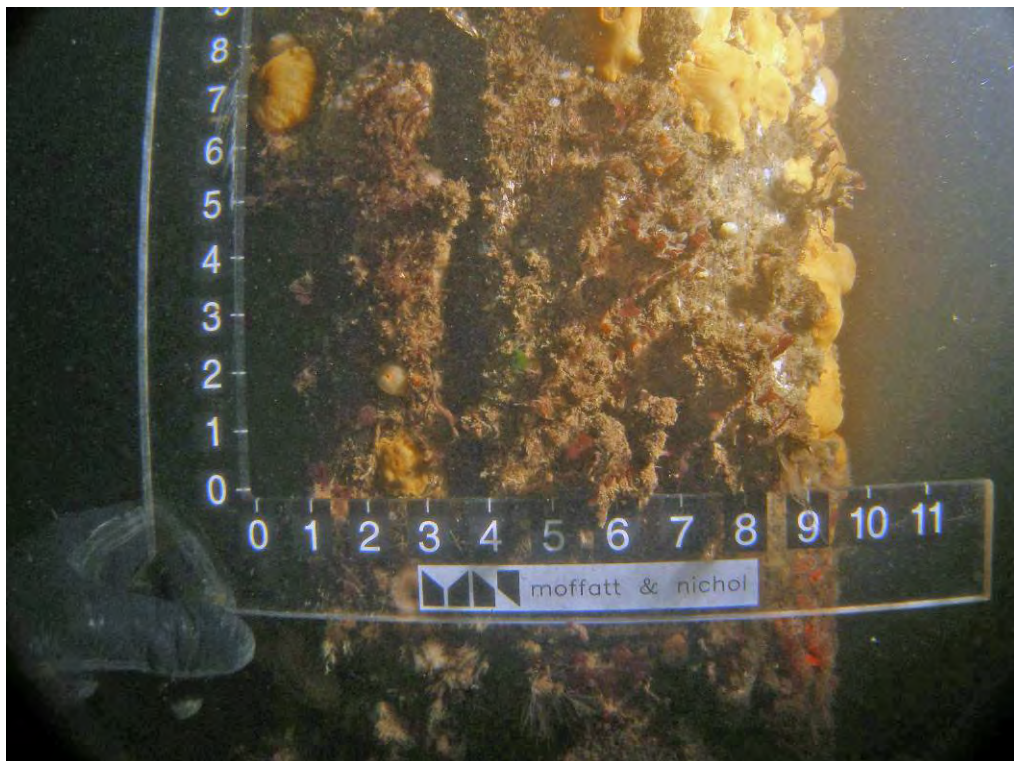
Bent 75, Pile 4 – Crack with 50% section loss inside
